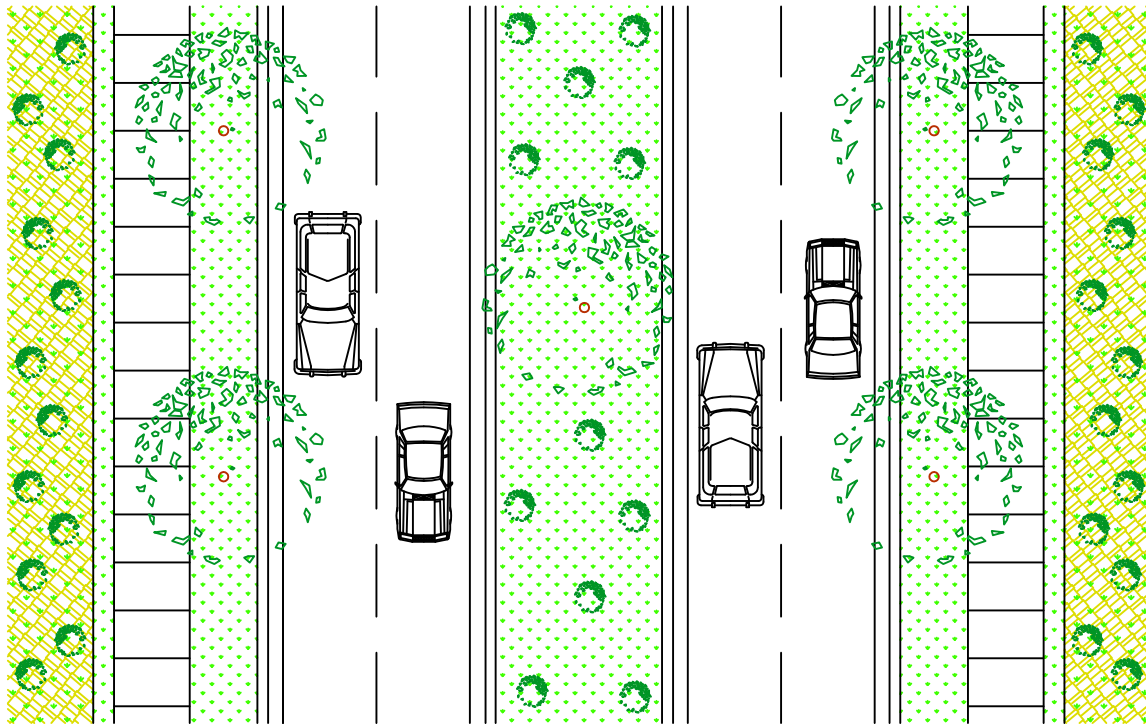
Road Section (Roundabout "A": Lost Canyon Road at Jakes Way)
